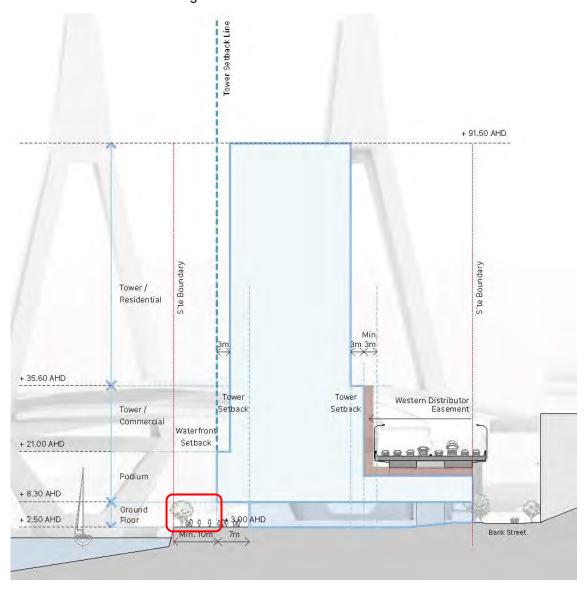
Walkway highlighted in red shown over Indicative Section B-B' of PLO 02 Building Envelope (Area 2)
